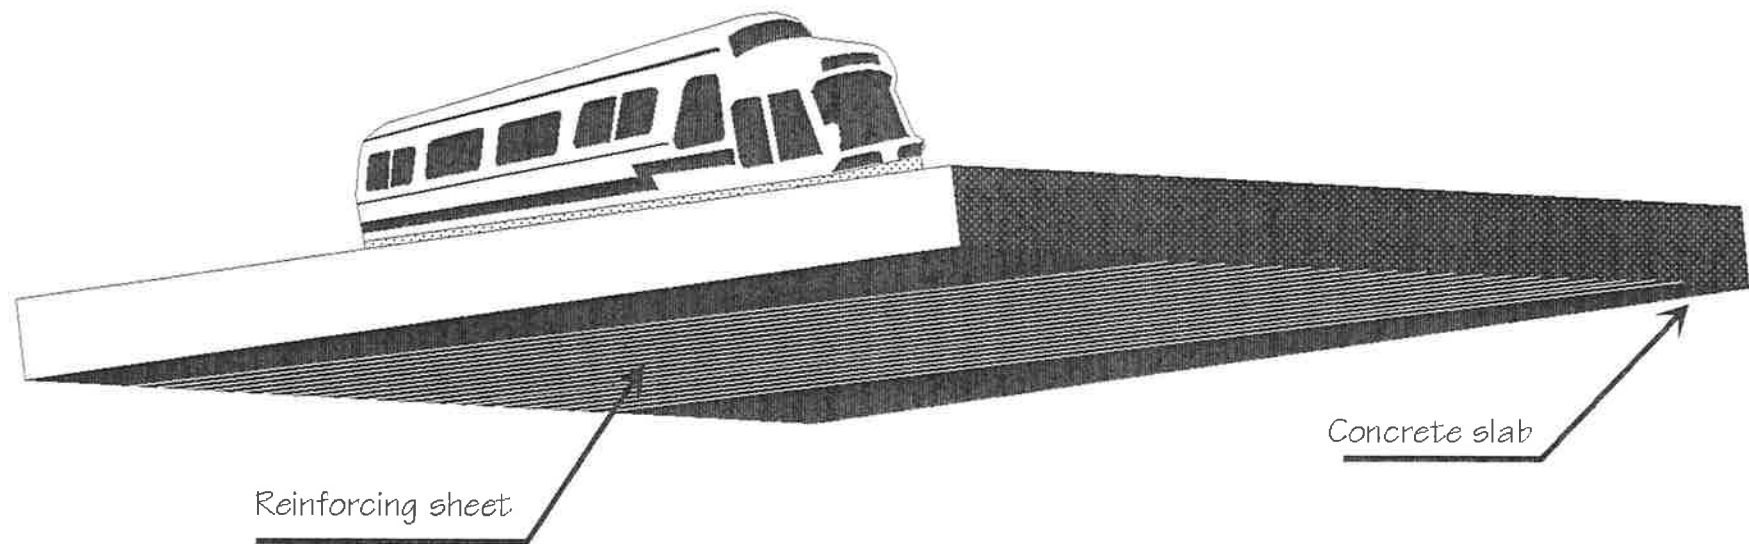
CFRP reinforcing sheet to improve bridge capacity.
